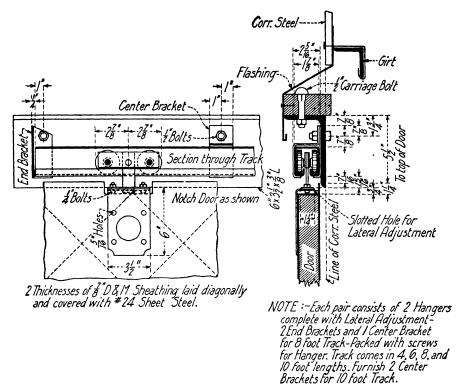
DETAILS OF A TRACK FOR A SLIDING DOOR.
